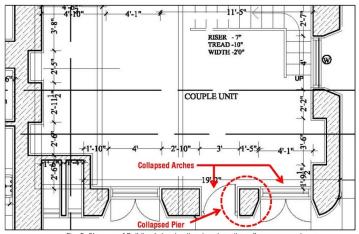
Close-up of Building I showing the pier where the collapse occurred.
